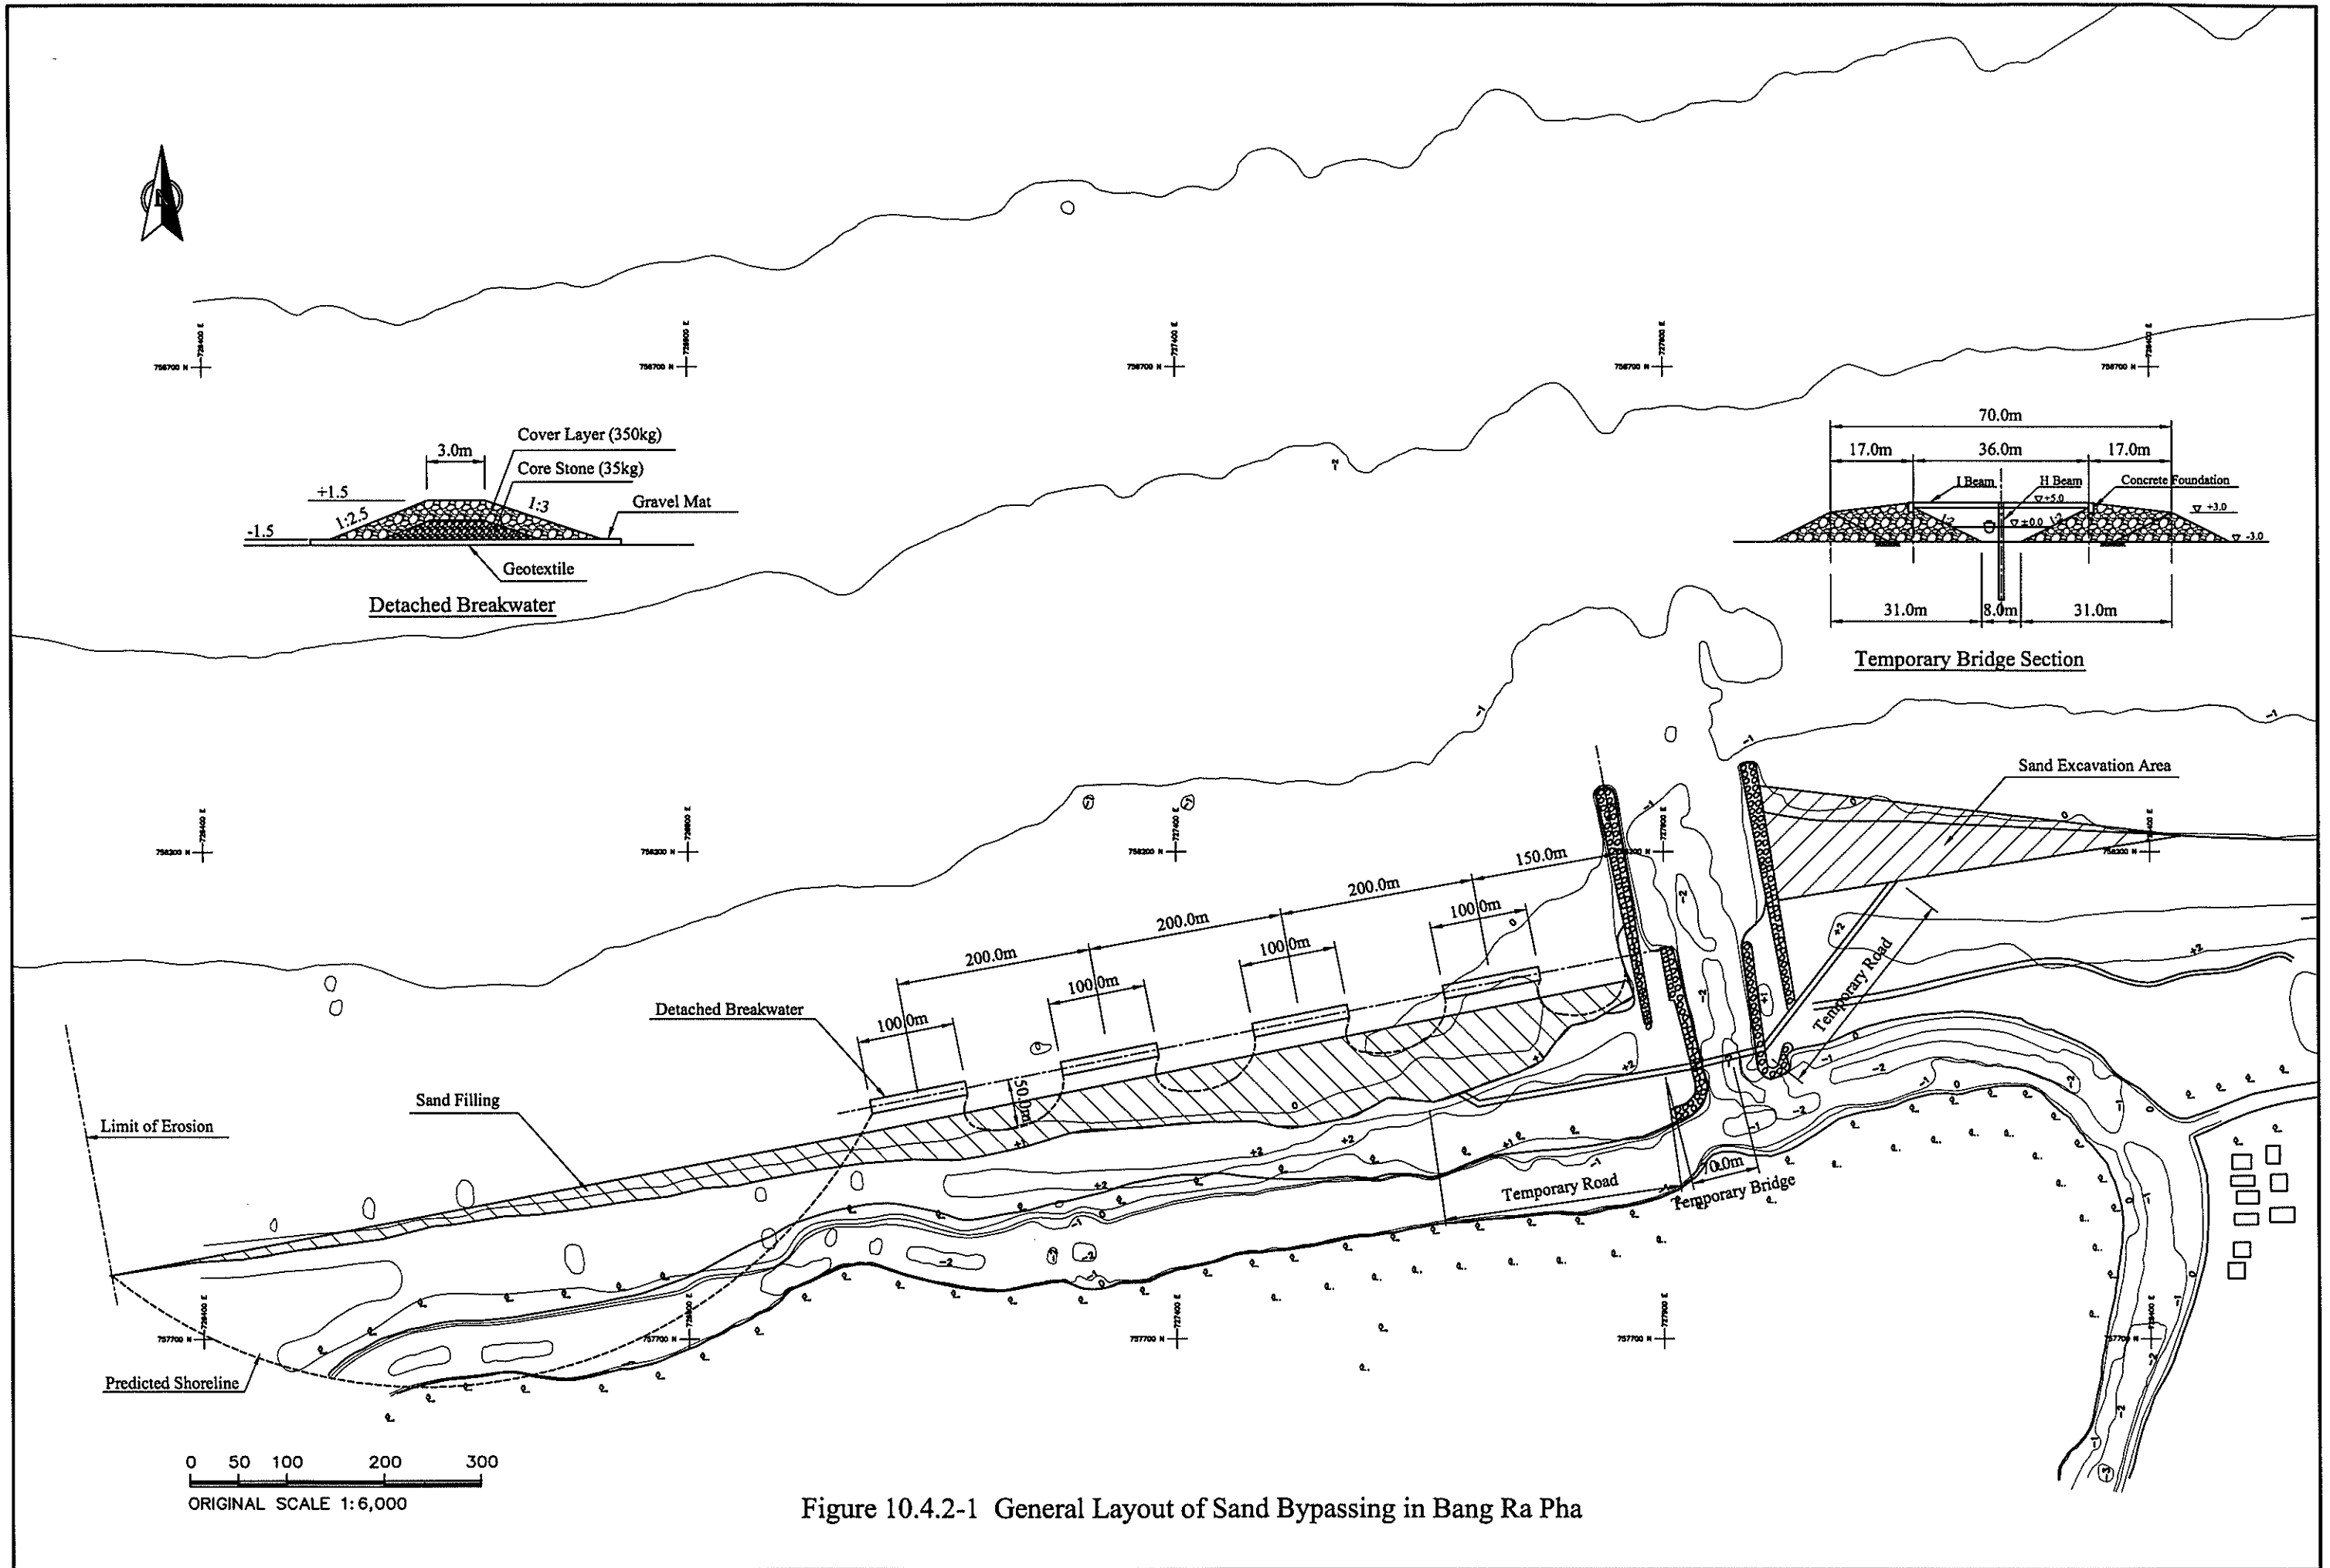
General Layout of Sand Bypassing in Bang Ra Pha
